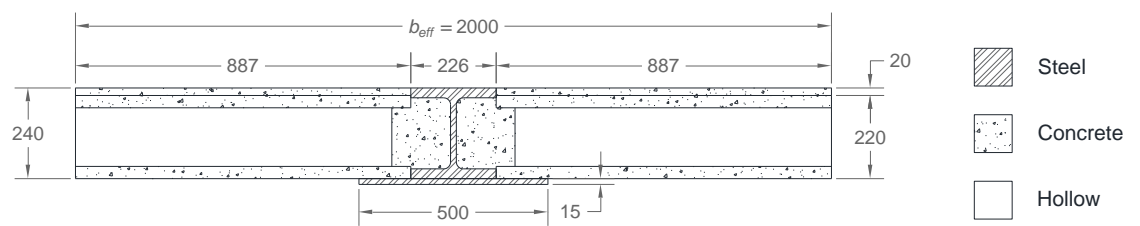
Slim floor beam cross-section with effective part of HCS and concrete (Example 2)
